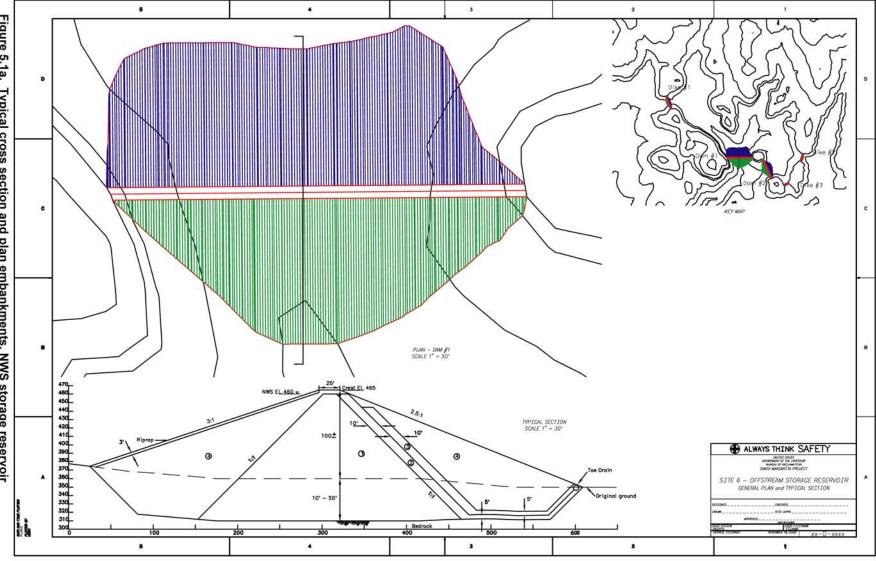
Typical cross section and plan embankments, NWS storage reservoir
